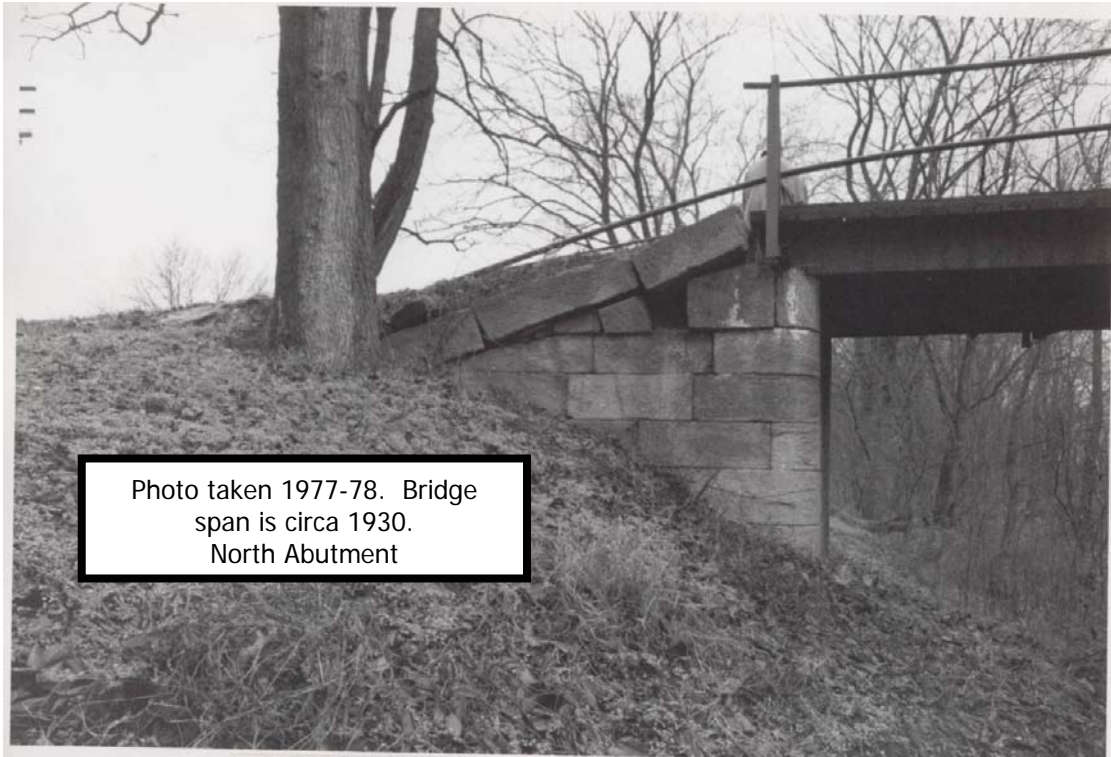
Bridge span is circa 1930. North Abutment
